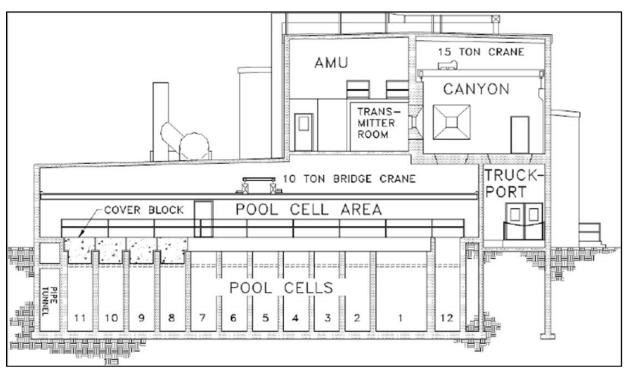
Waste Encapsulation and Storage Facility 225-B Building North/South Sectional View
